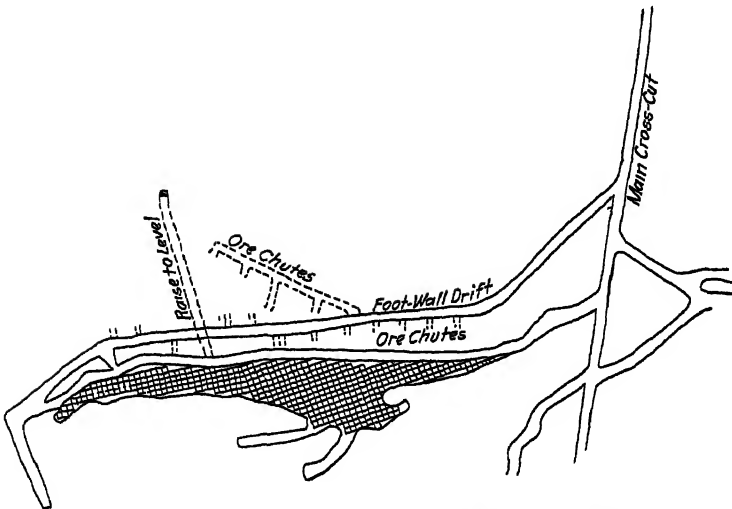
DAY STOPE; SILL FLOOR COMPLETELY MINED.
